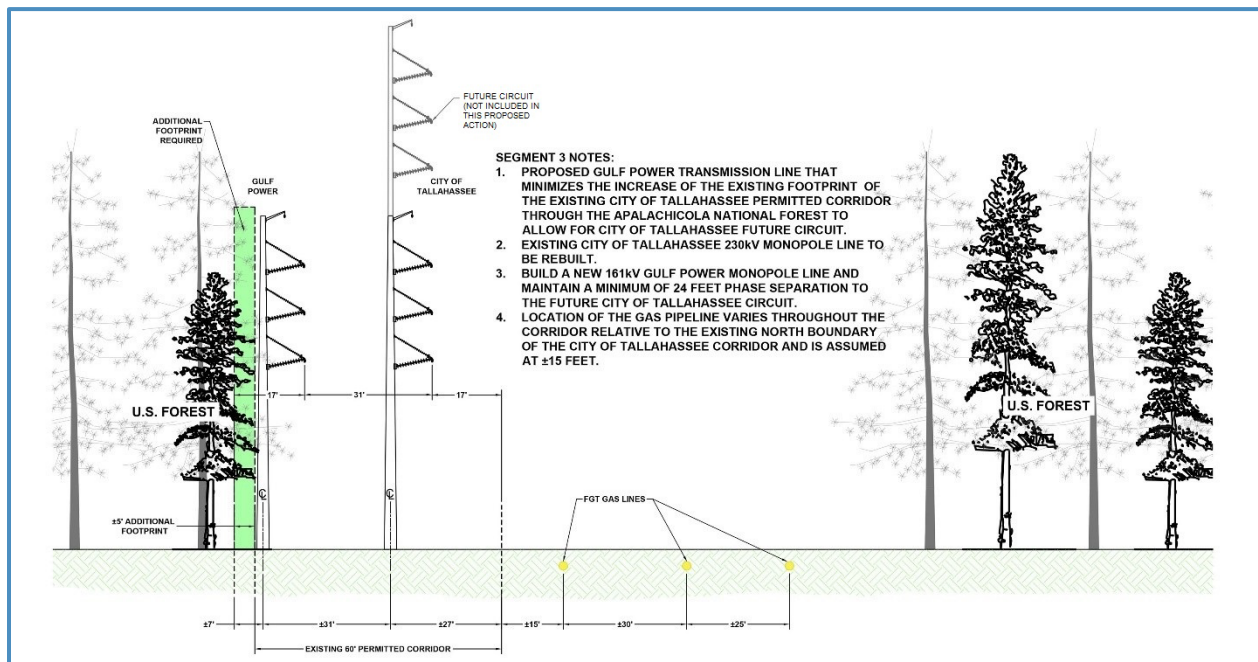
Segment 3 Corridor Cross Section Looking West
